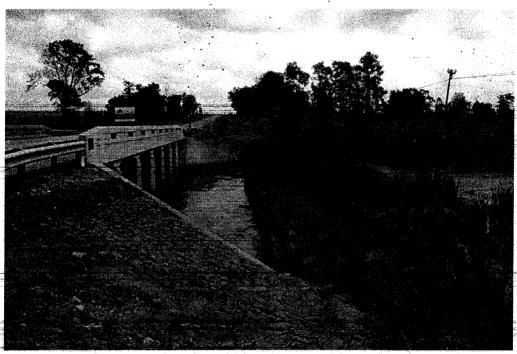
Installation of a weir wall at Site C1UNSP-SPITS upstream of the bridge crossing to prevent headcut erosion
